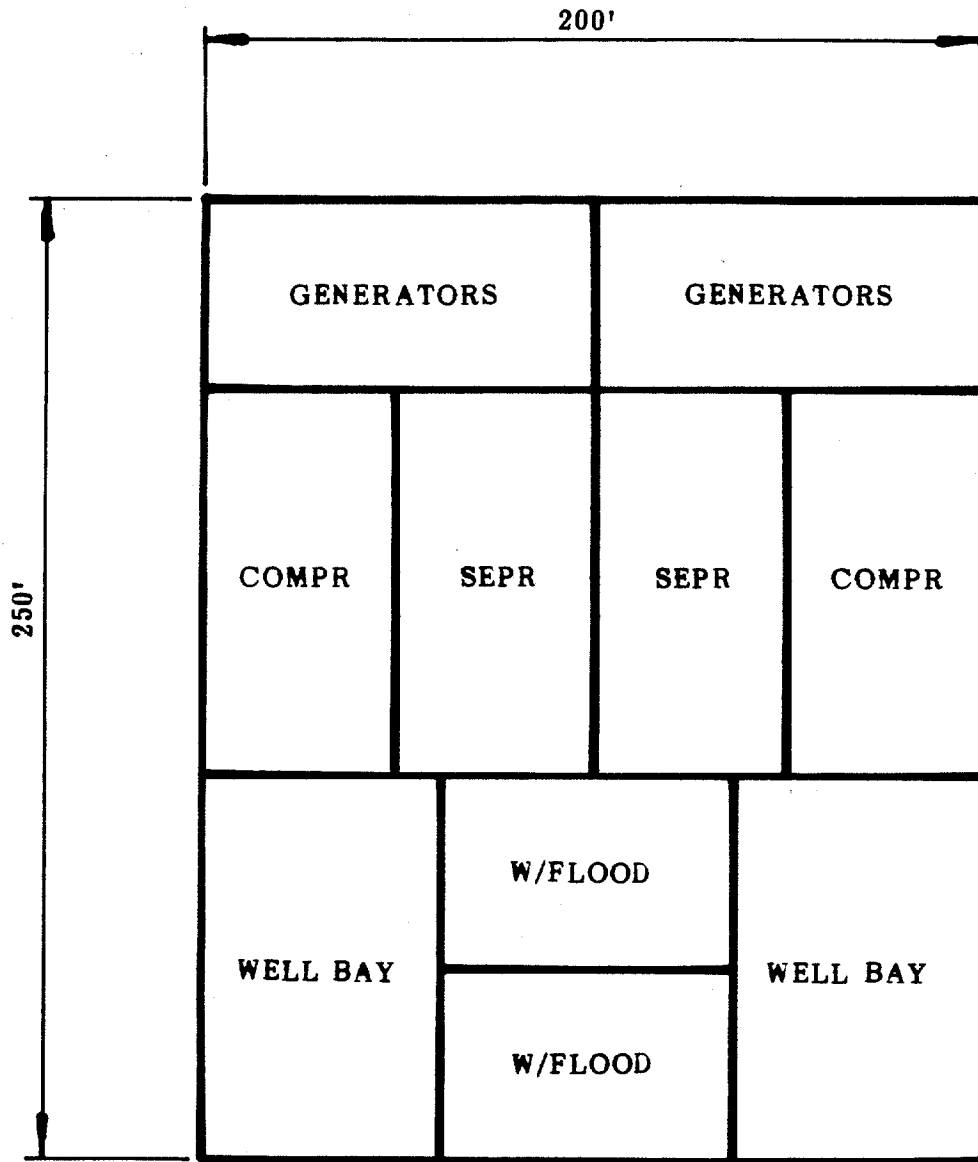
LEVEL 1 DECK LAYOUT
